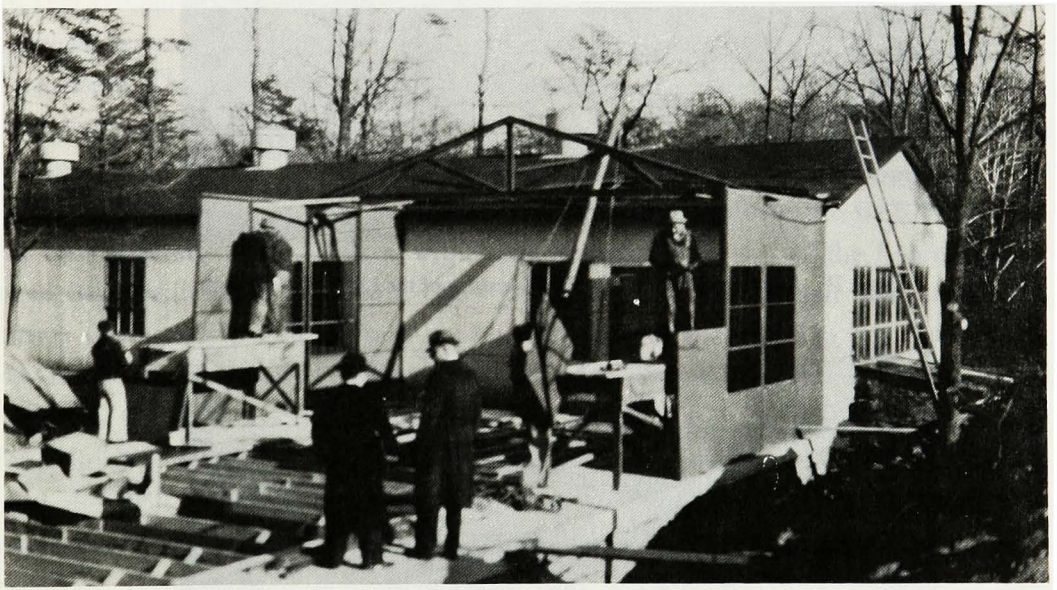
Walls going up on the addition to the BEB's facility on Dalecarlia Reservation, Washington, D.C., winter, 1939-40.
